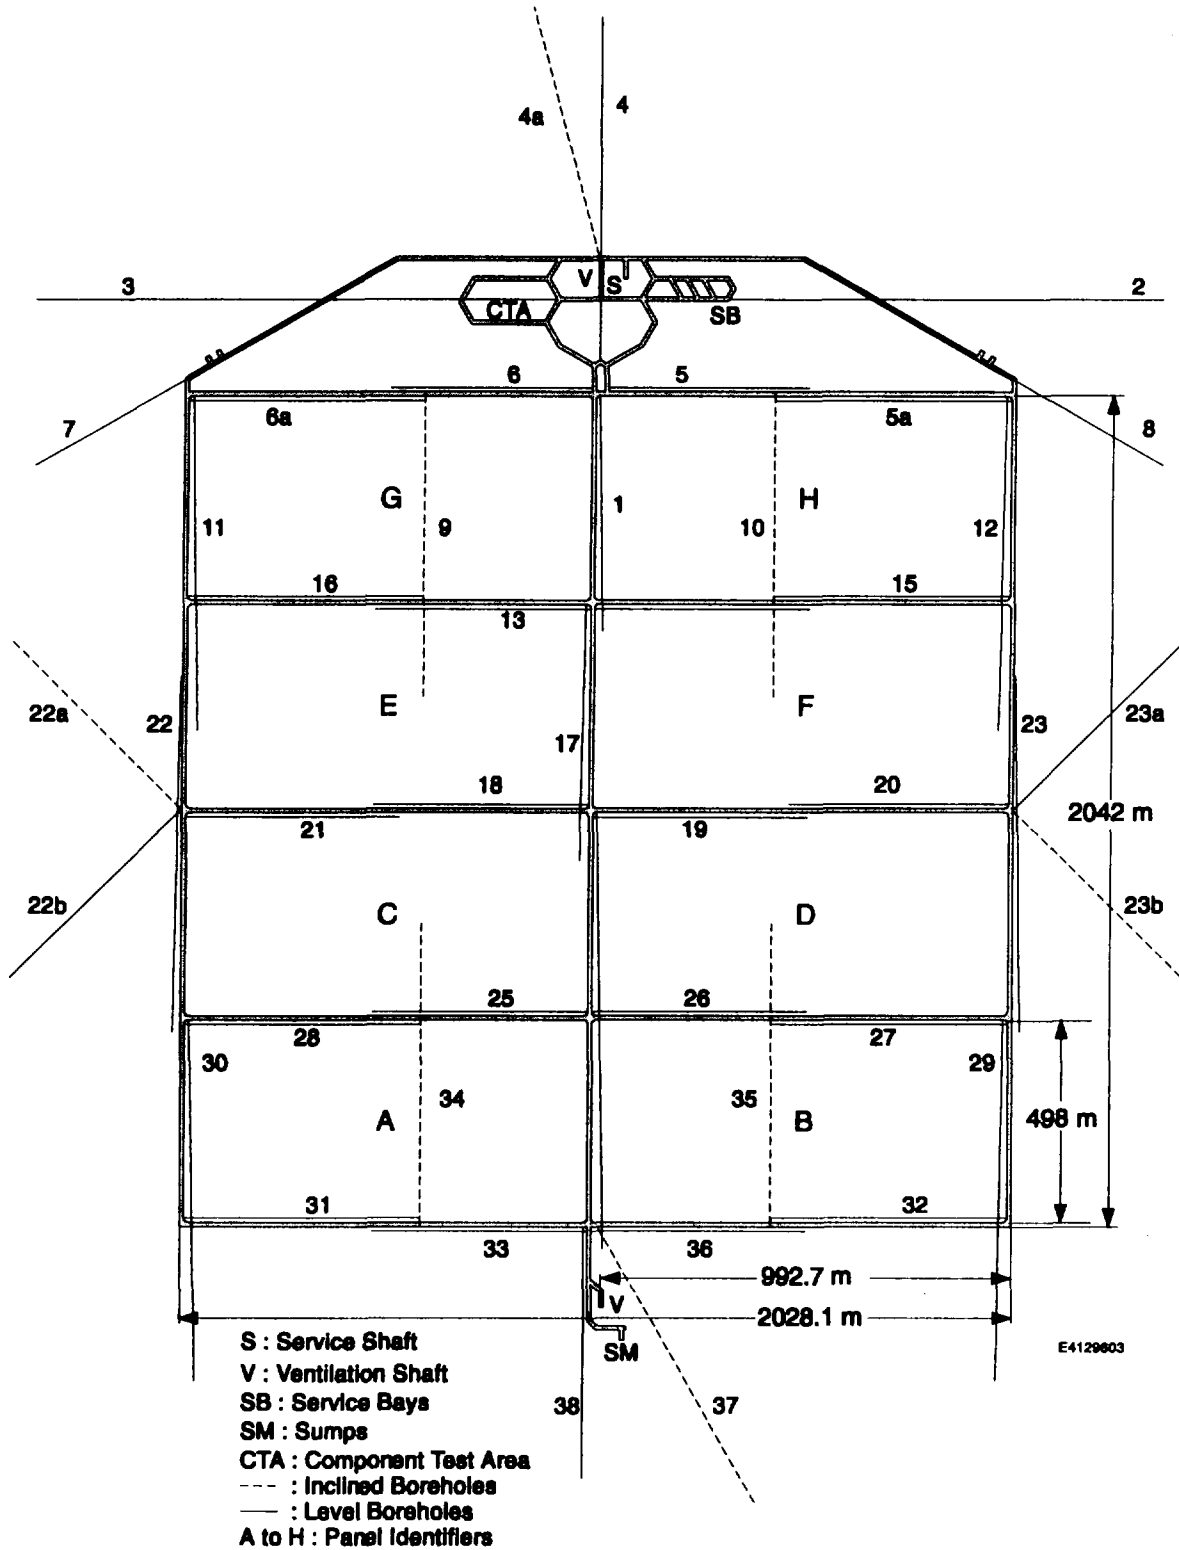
Vault Layout at the End of the Underground Evaluation Substage
